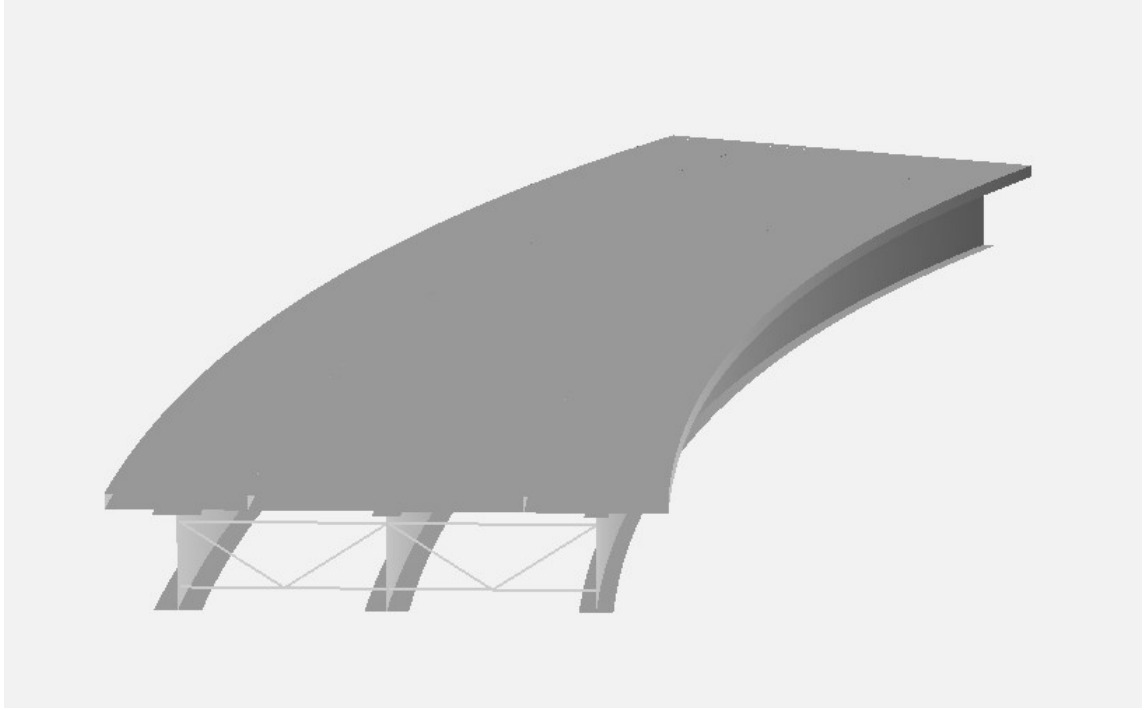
Test bridge slab casting: the slab is cast in one continuous stage
